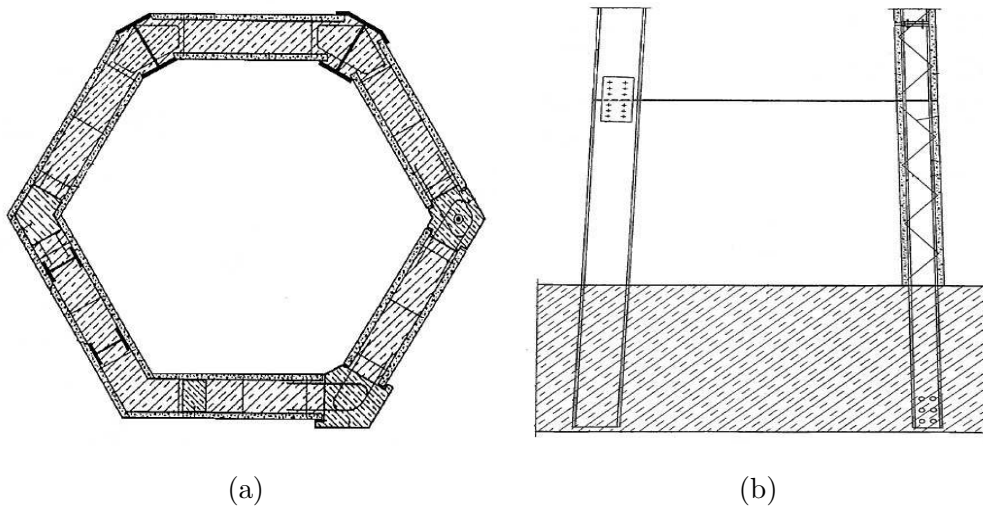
Tower structure, taken from [33]; (a) cross-section of a ring segment; and (b) longitudinal section of the tower
